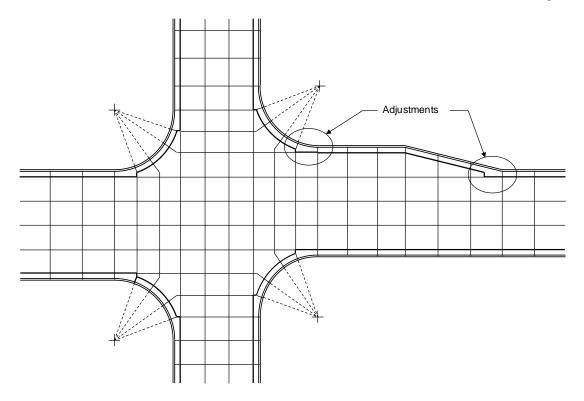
Typical Joint Layout for a Rigid Pavement Intersection (Shows Lane Configuration, Step 10)
